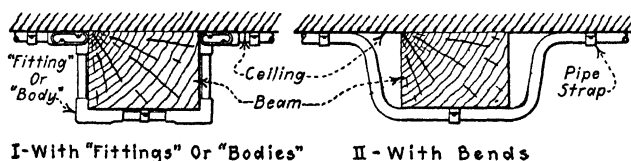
Correct methods of carrying exposed conduit runs around beams.
